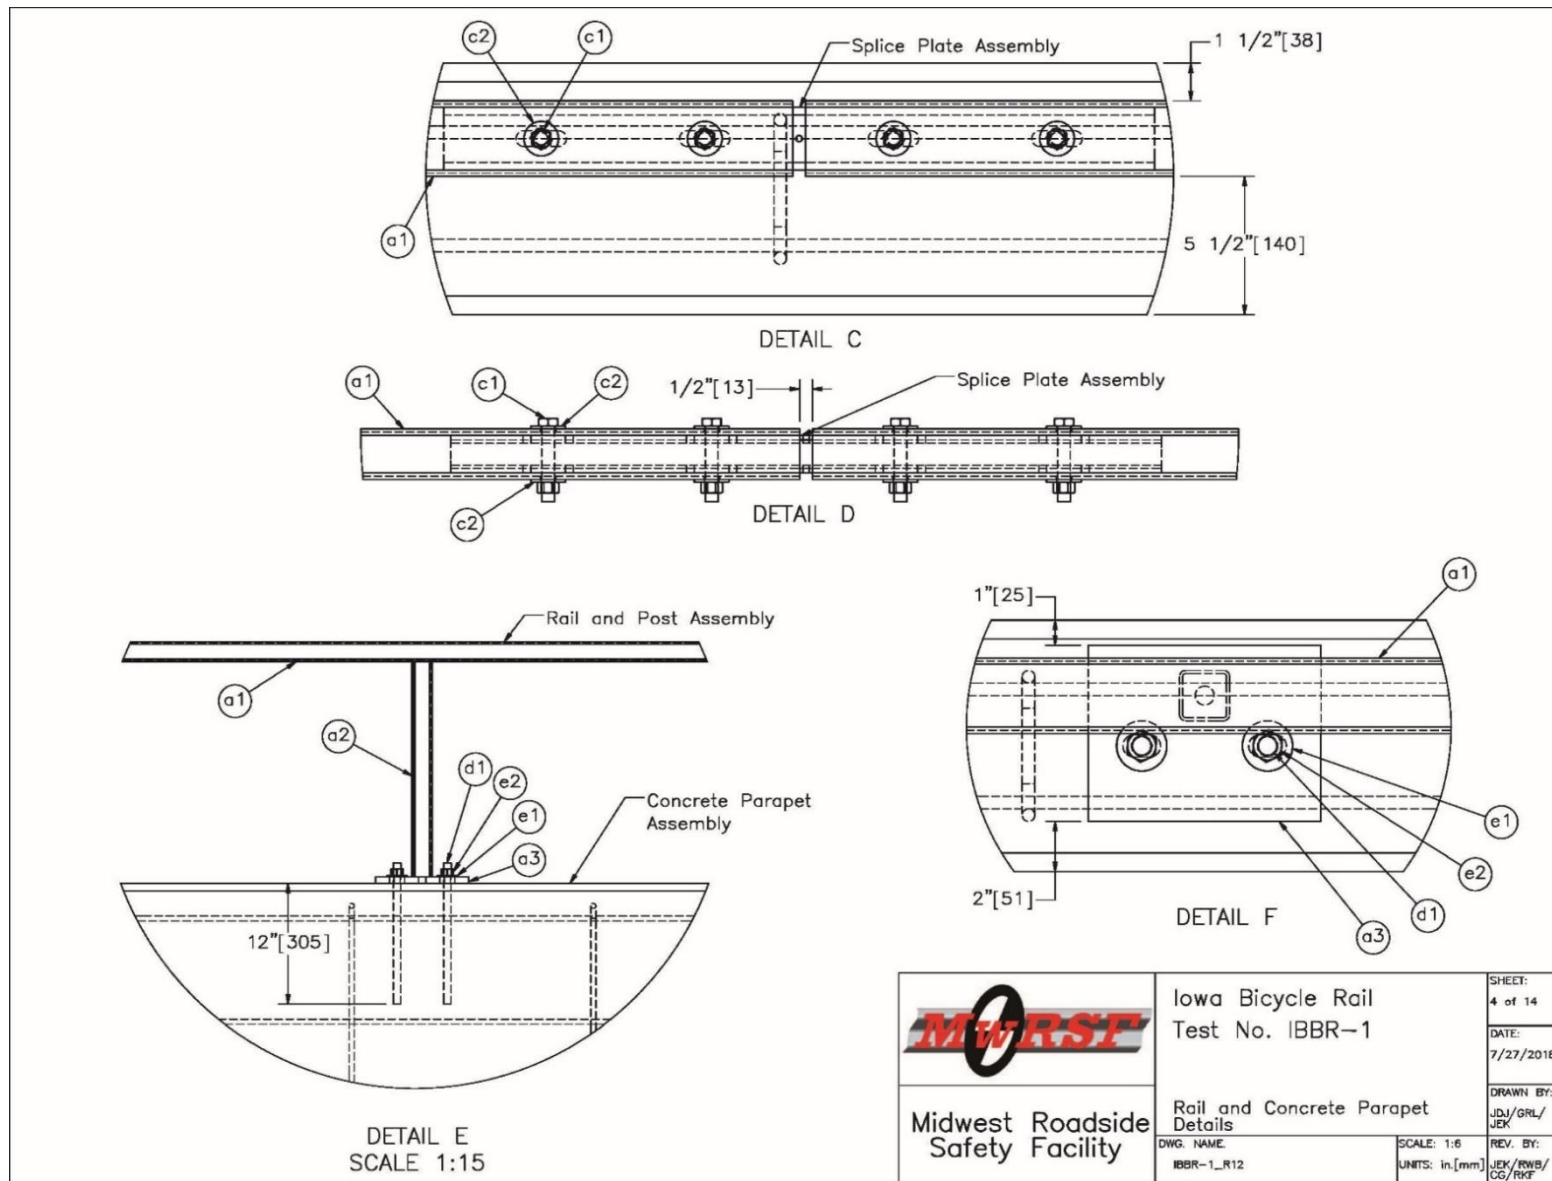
Iowa Bicycle Rail – Rail and Concrete Parapet Details
